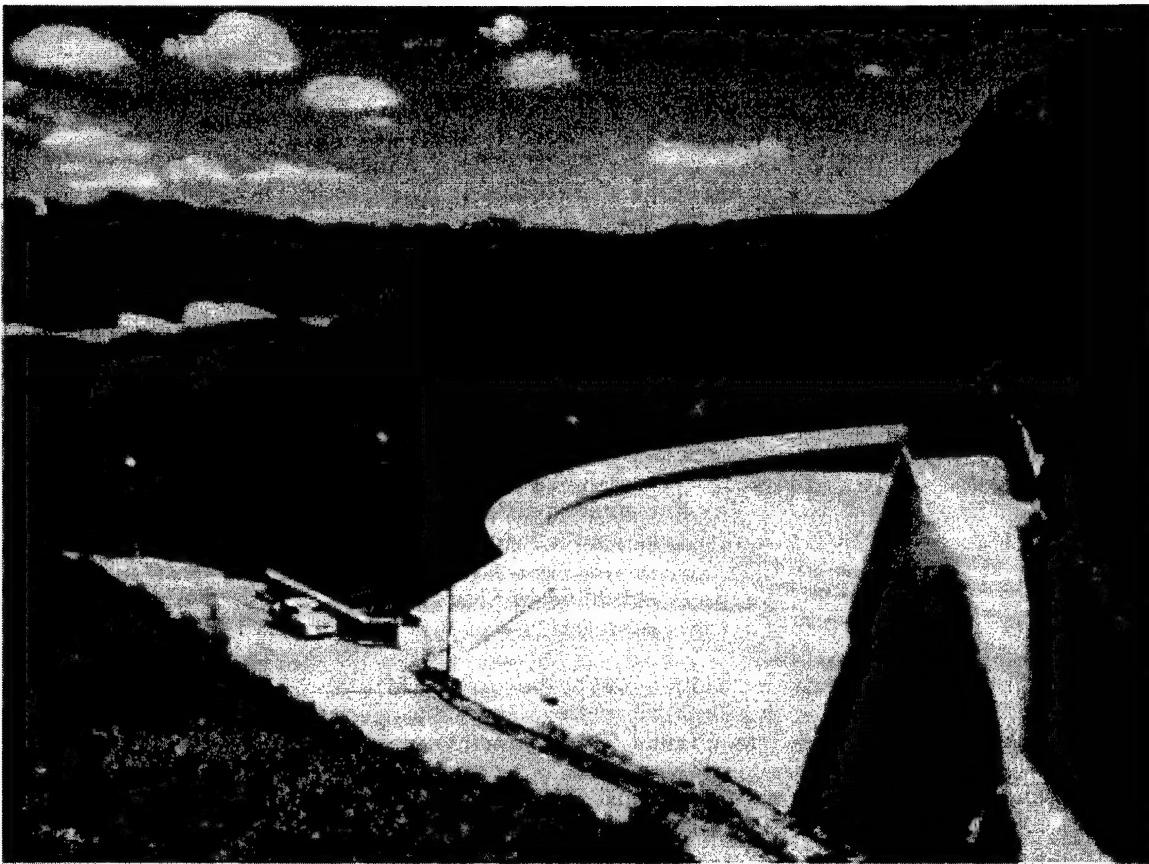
East Canyon Dam with spillway notch near left abutment (USBR)
